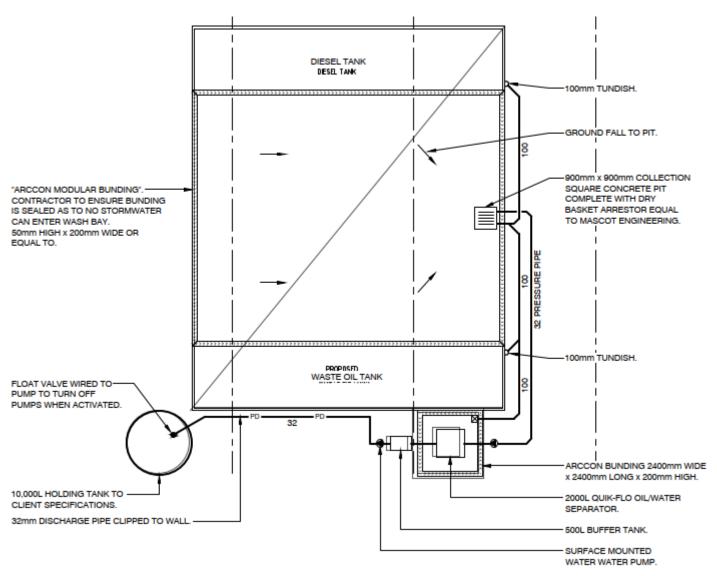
Proposed Wash Bay layout (Northrop, 2021)
